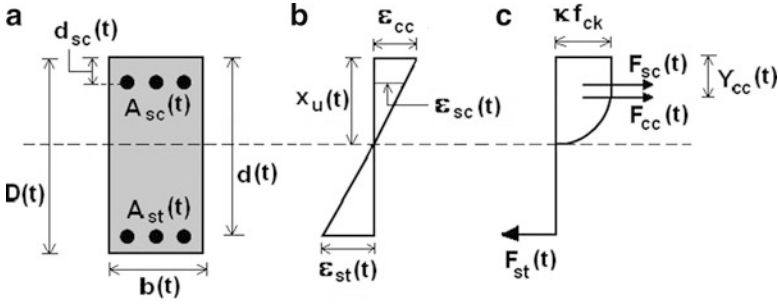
Typical cross section of an un-corroded RC beam
